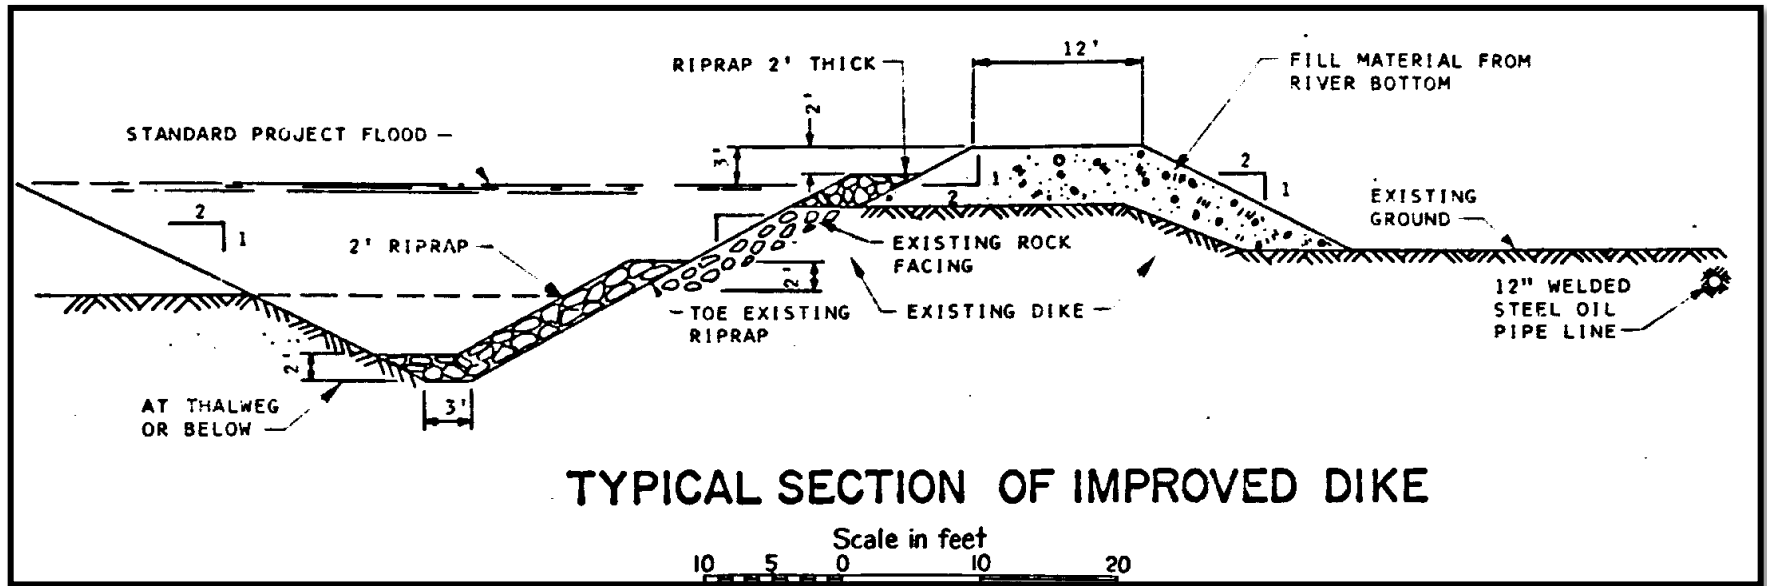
Typical Cross Section from Original Levee Design completed by the USACE in 1940.
